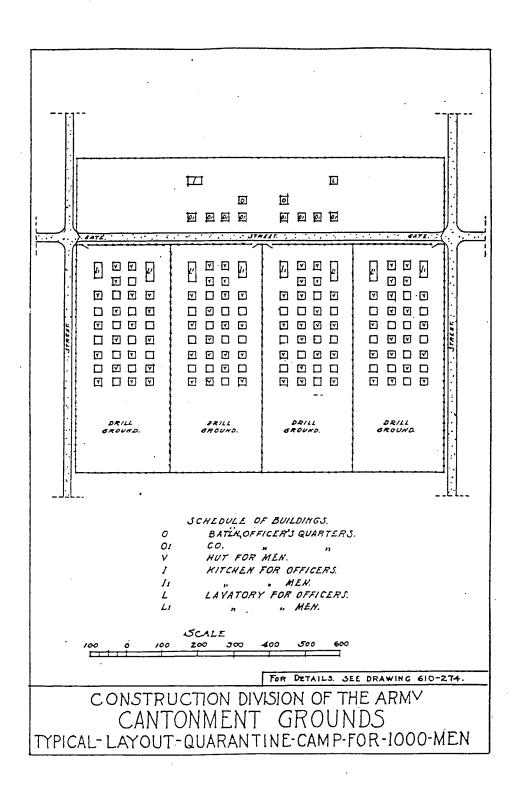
Typical Layout, Quarantine Camp for 1,000 Men. Source: Manual of the Construction Division of the Army, Section C, Engineering Division, 1918.
